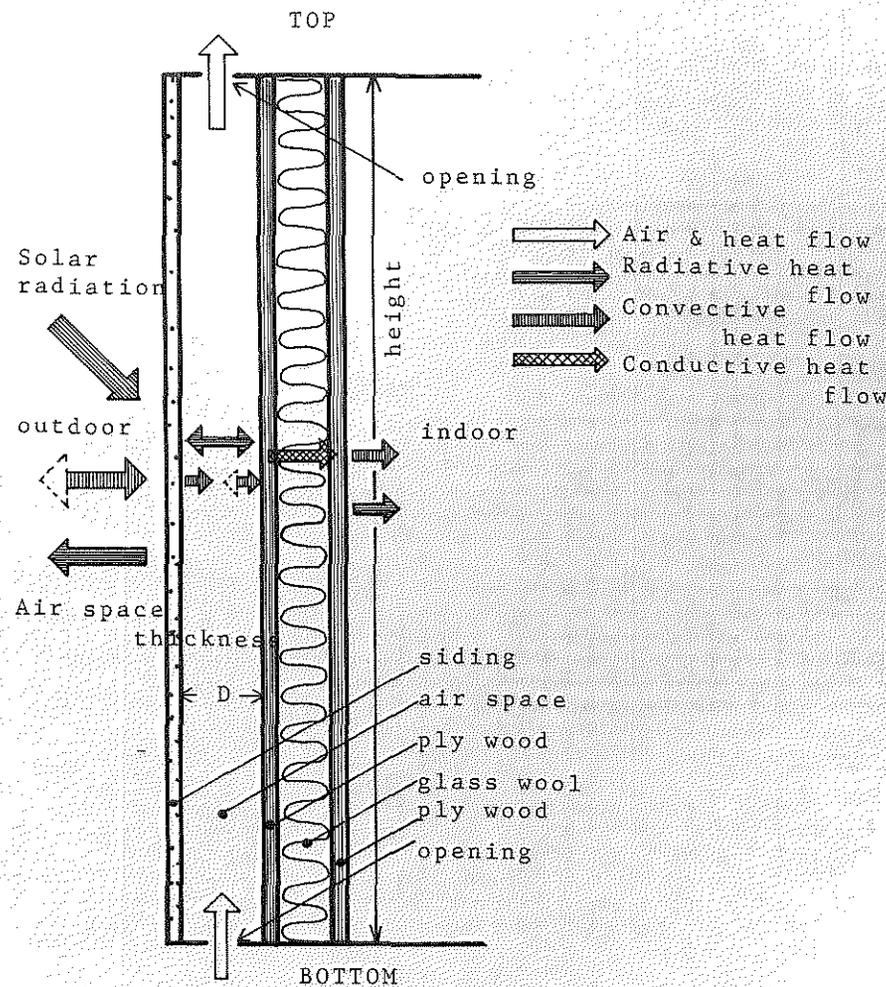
Model of Gross Heat and Air Flows at a Wall (Vertical Section)
